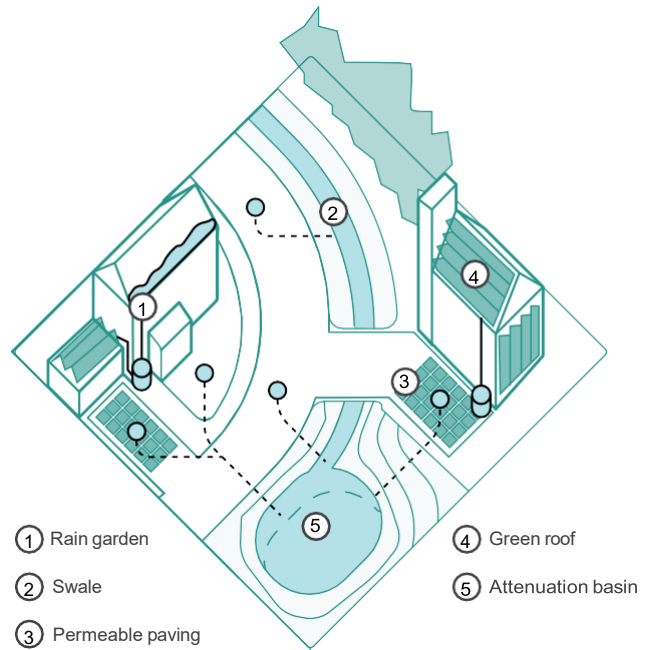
Diagram showing the best use of harvesting water systems rain garden, swales, permeable paving, green roofs
